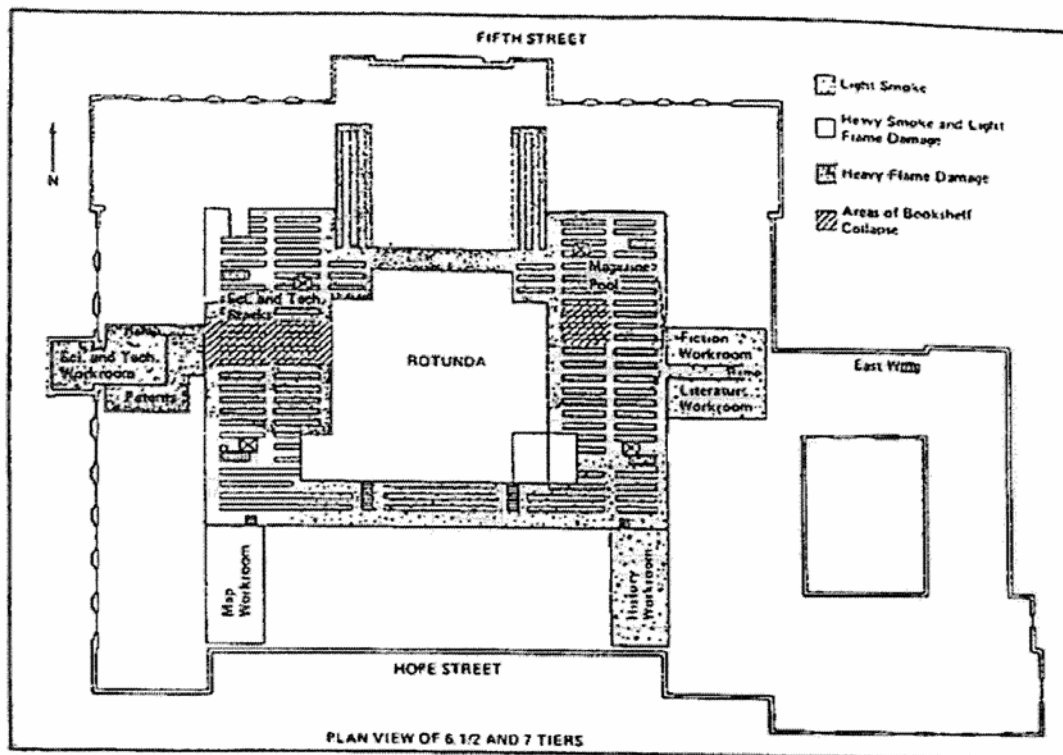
Floor plan of Tiers 6 1/2 and 7. The three workrooms and the Patent Room were on the 6 1/2-tier level.
